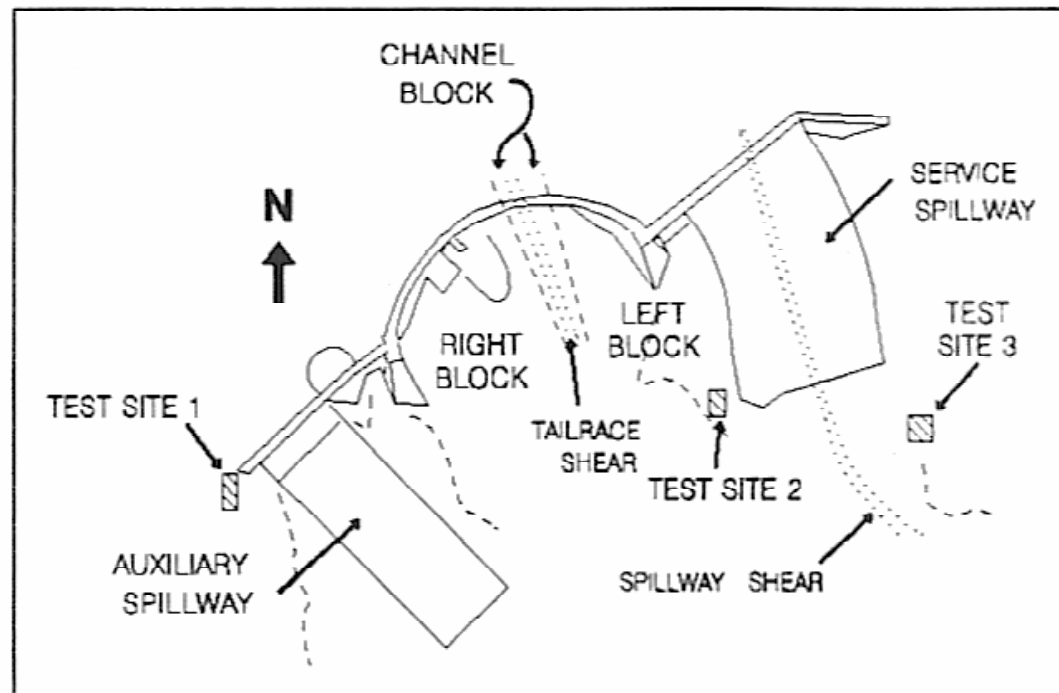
Location of Main Structural Features & Anchor Test Sites
